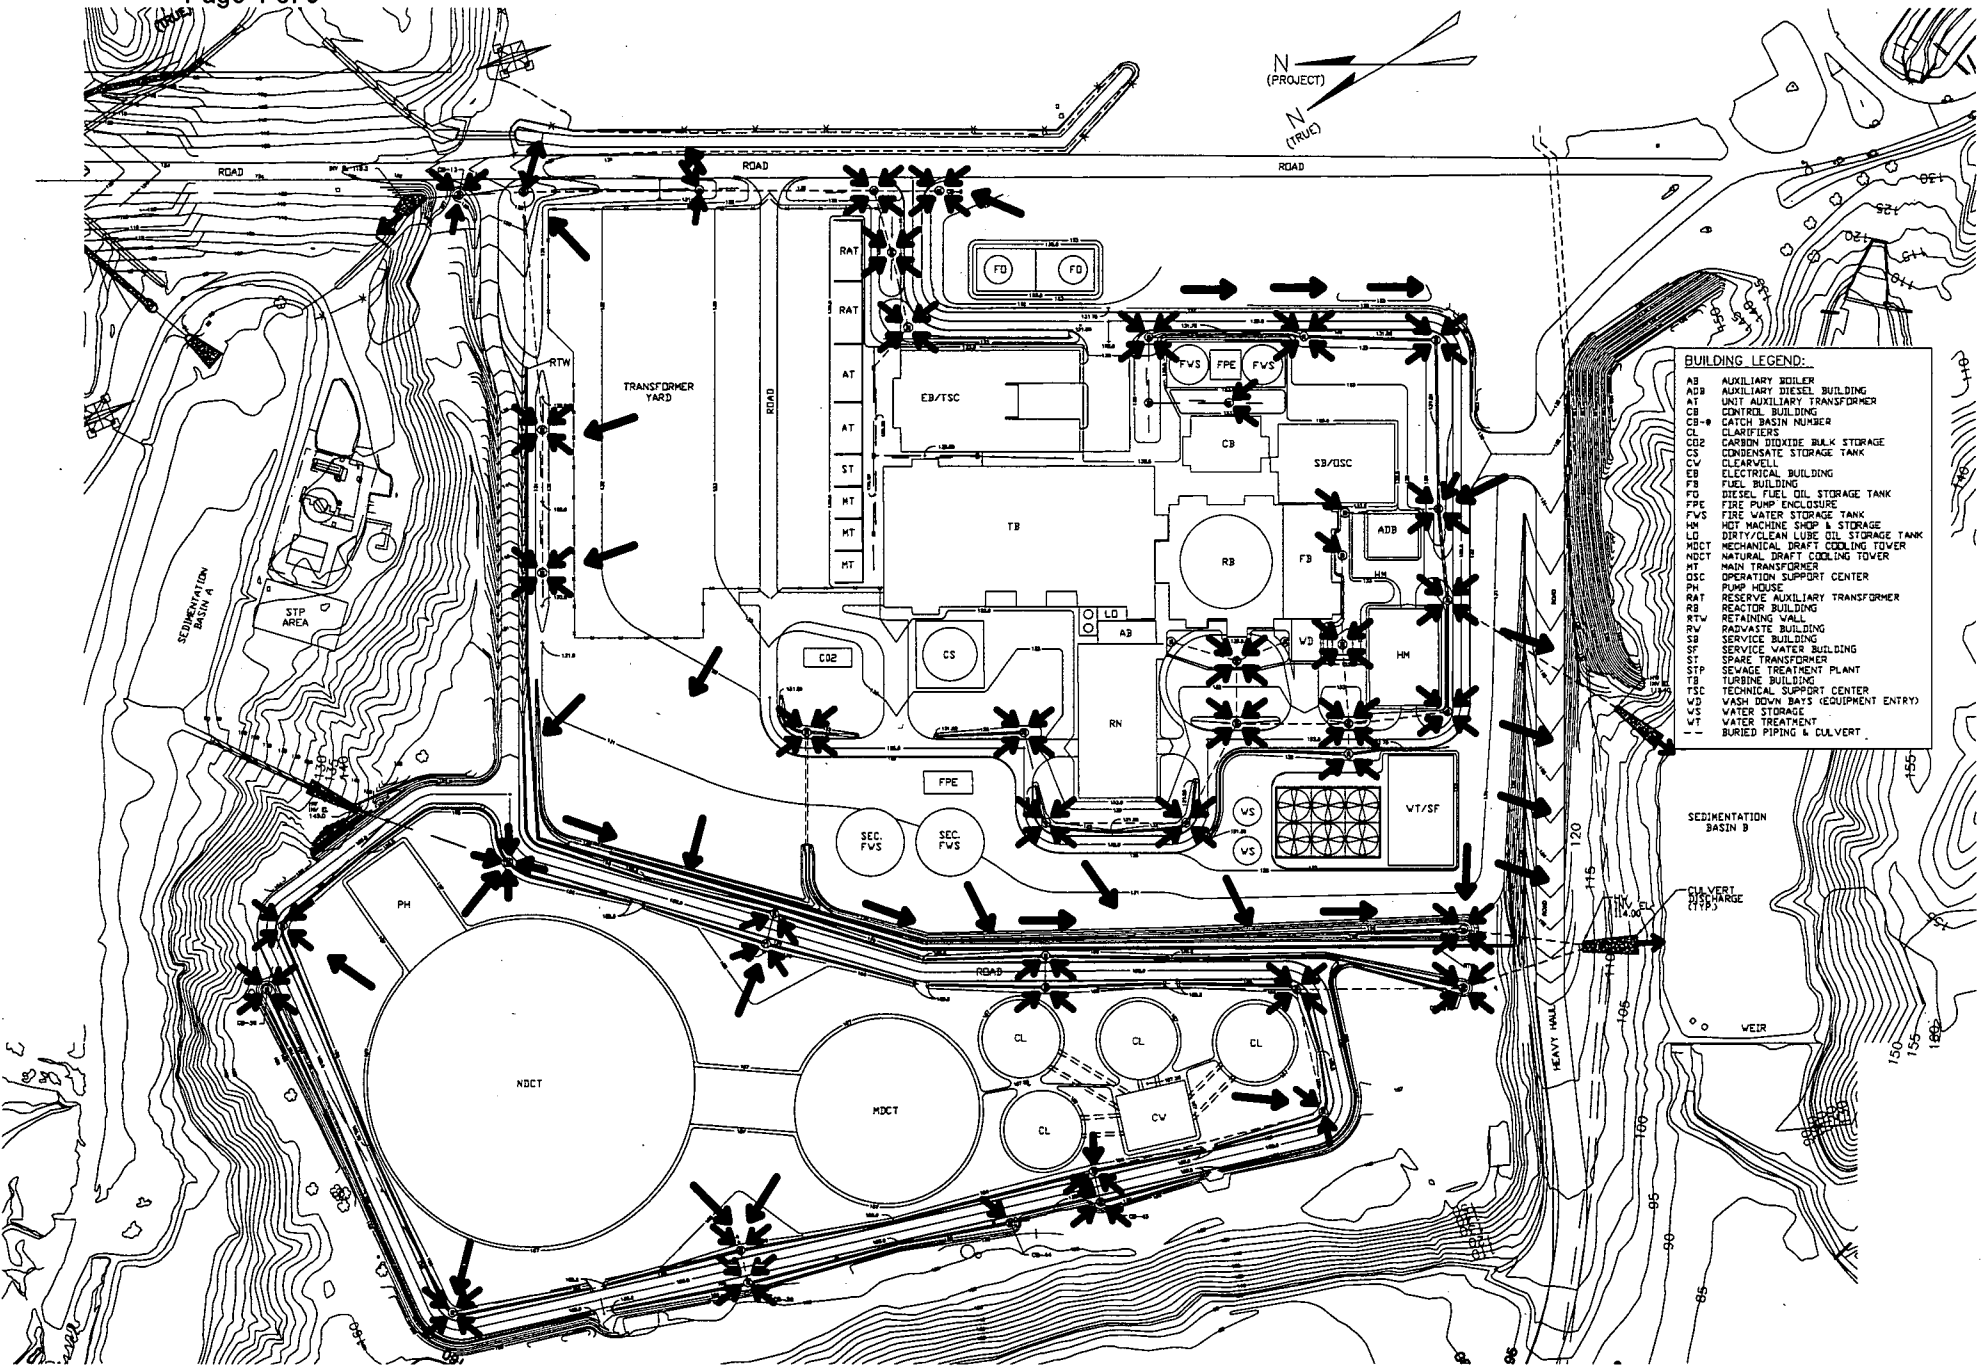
Site Drainage Schematic
